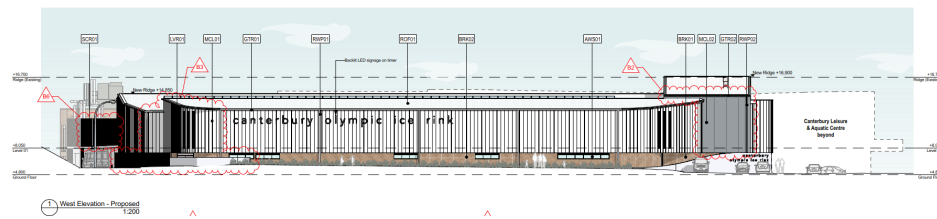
Proposed West Elevation (Source: Kennedy Associates Architects 2024 2221-DA201 Rev C)
